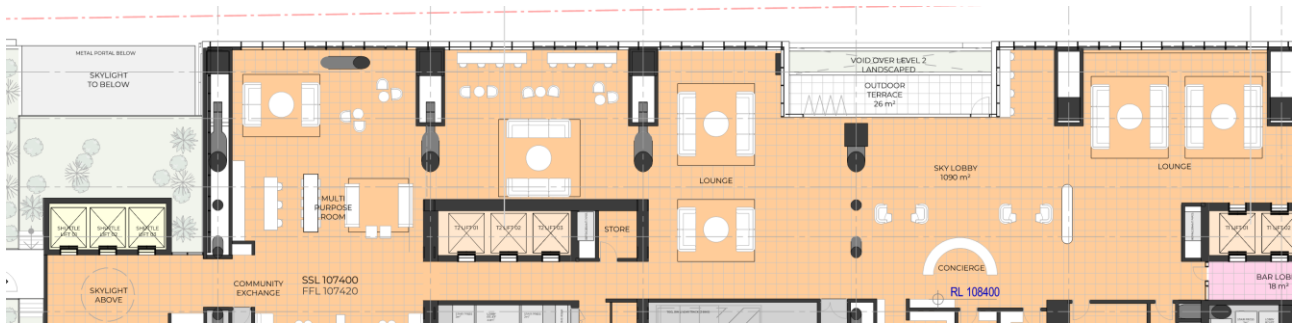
Amended Level 3 outdoor terraces (Source: Woods Bagot)
